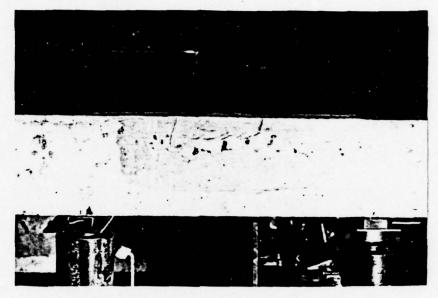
Beam T-2-P at a load of 4.6 kpj just after horizontal cracking became evident.
